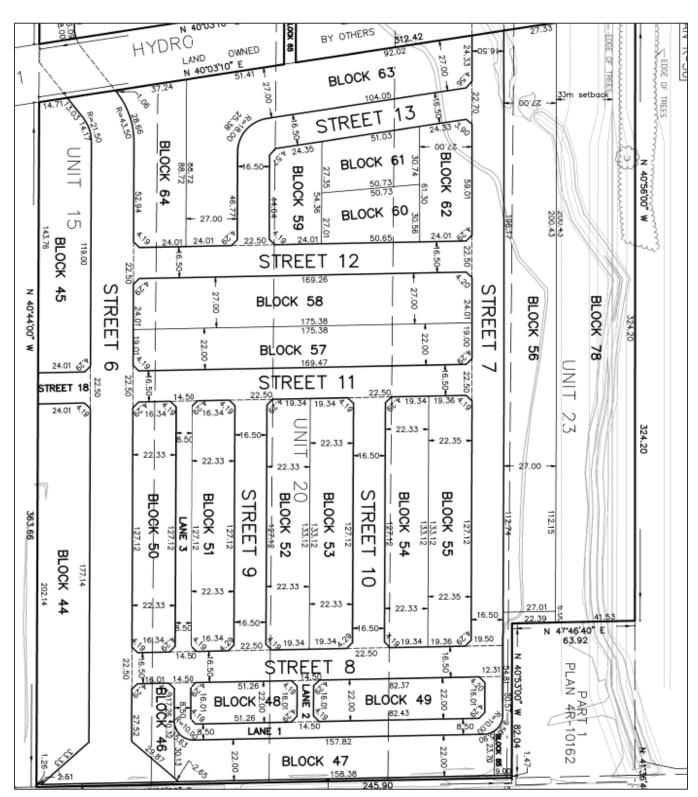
Extract from Revised Plan of Subdivision, Lands North of Perth Street
